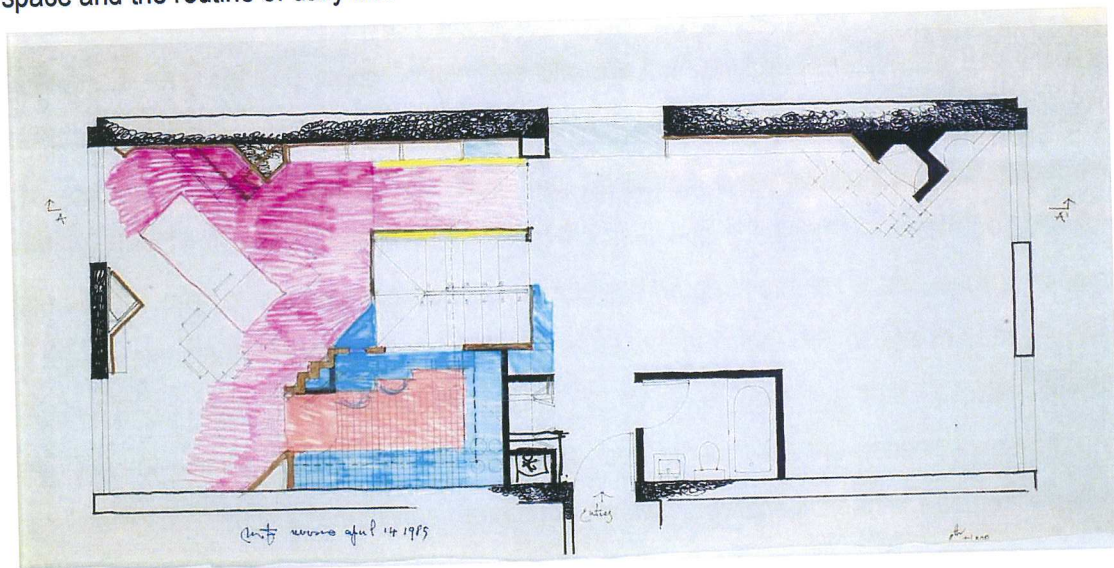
Master's Apartment in the House of 1925, Sketch Design, Plan
